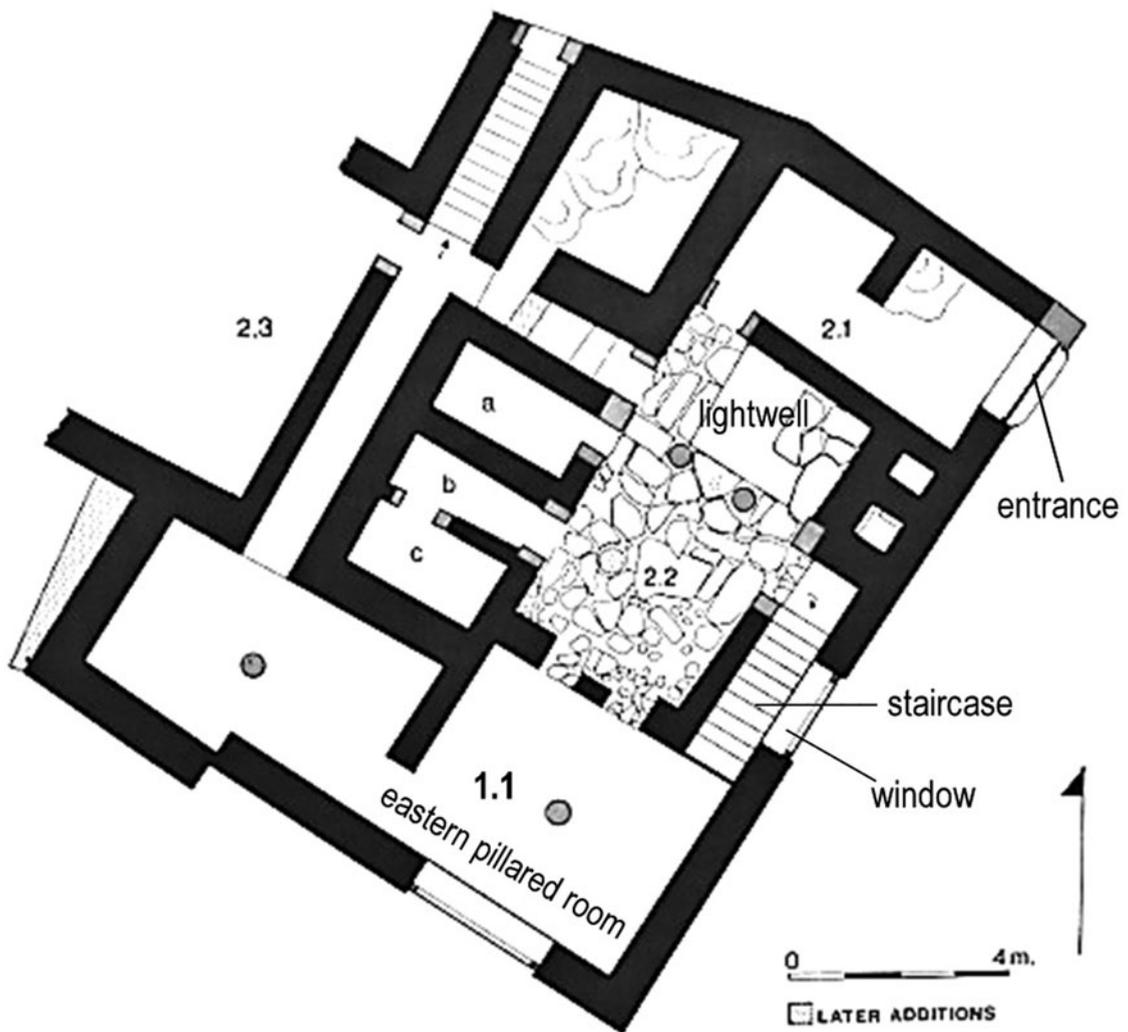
Plan of the East Wing of Building B.2. Modified from Soles and Davaras 1996, fig. 7.
